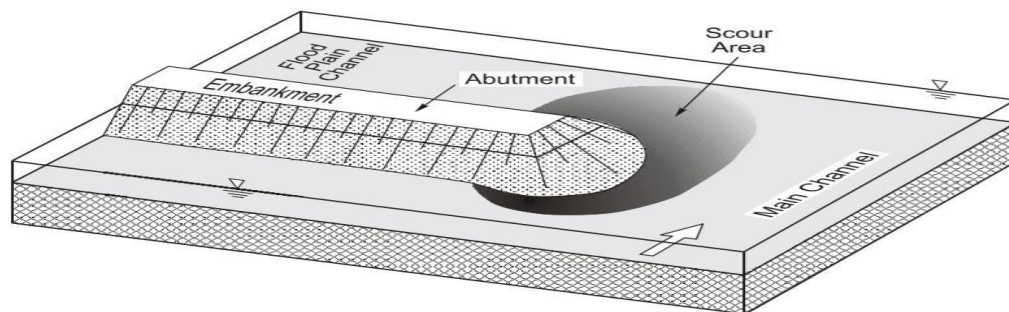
Contraction scour around abutment. (Source: Padmini Khwairakpam, 2009)
